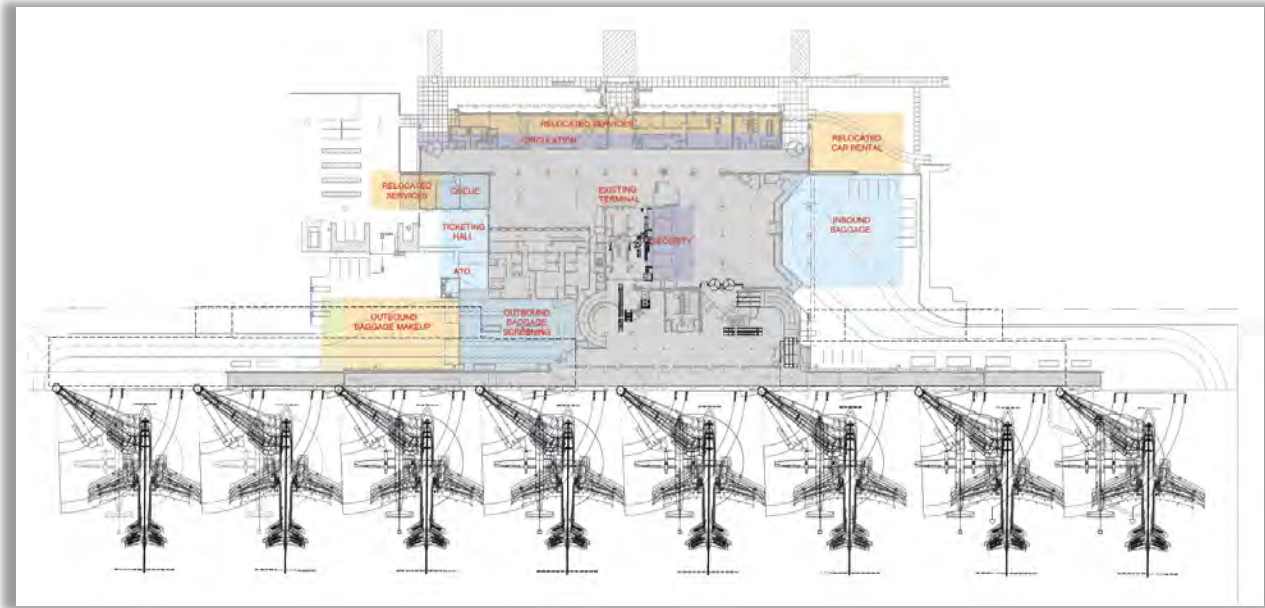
SECOND LEVEL TERMINAL BUILDING MASTER PLAN EXPANSION
